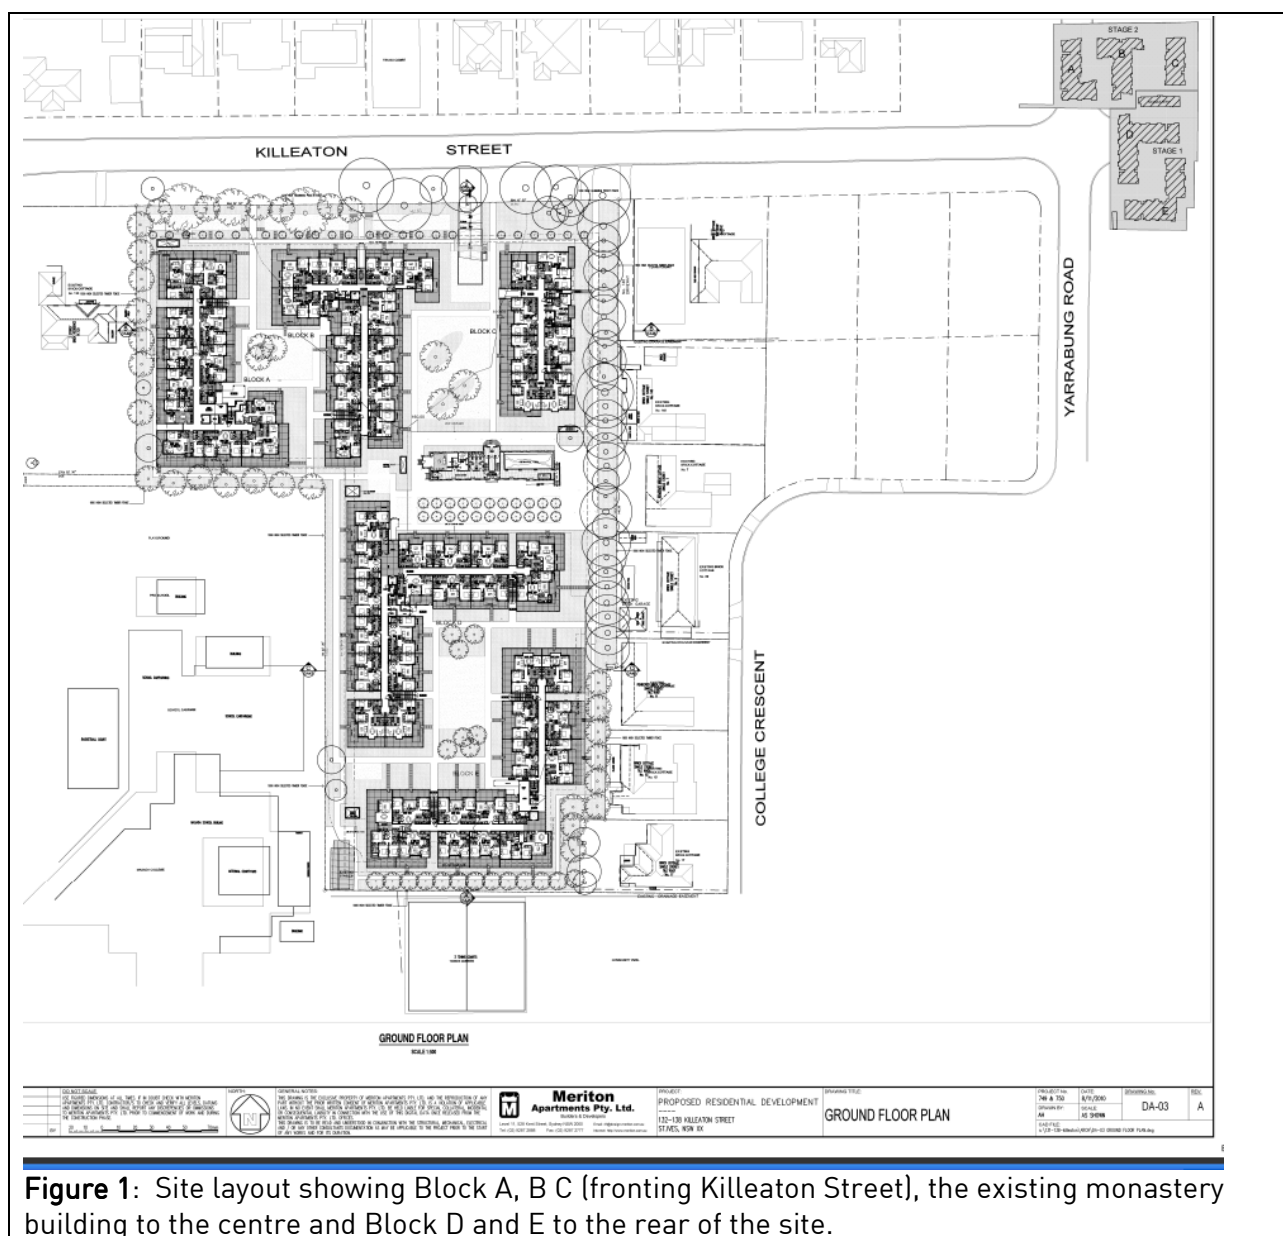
Site layout showing Block A, B, C (fronting Killeaton Street), the existing monastery building to the centre and Block D and E to the rear of the site.
